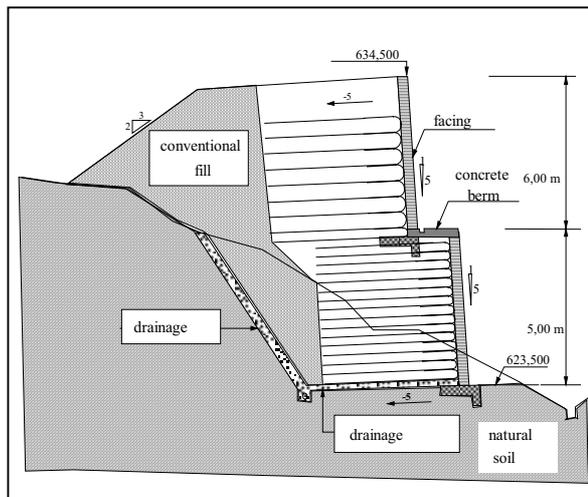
The cross section of the reinforced abutment on the left side in km 12 of the MG 123 motorway.
